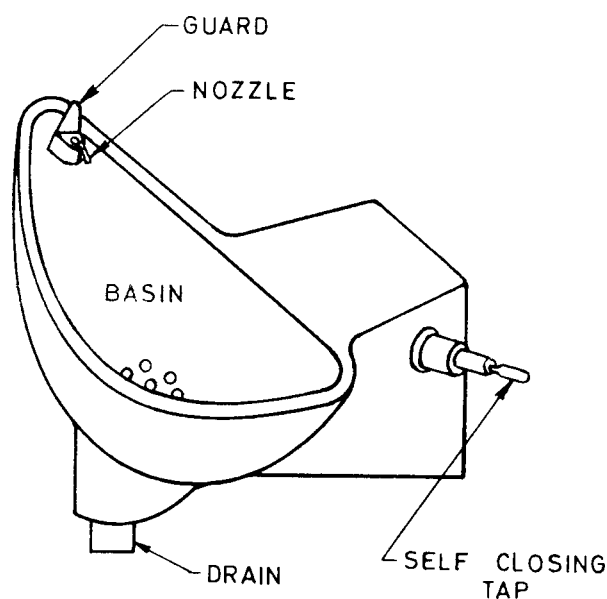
TYPICAL ILLUSTRATION OF DRINKING FOUNTAIN
